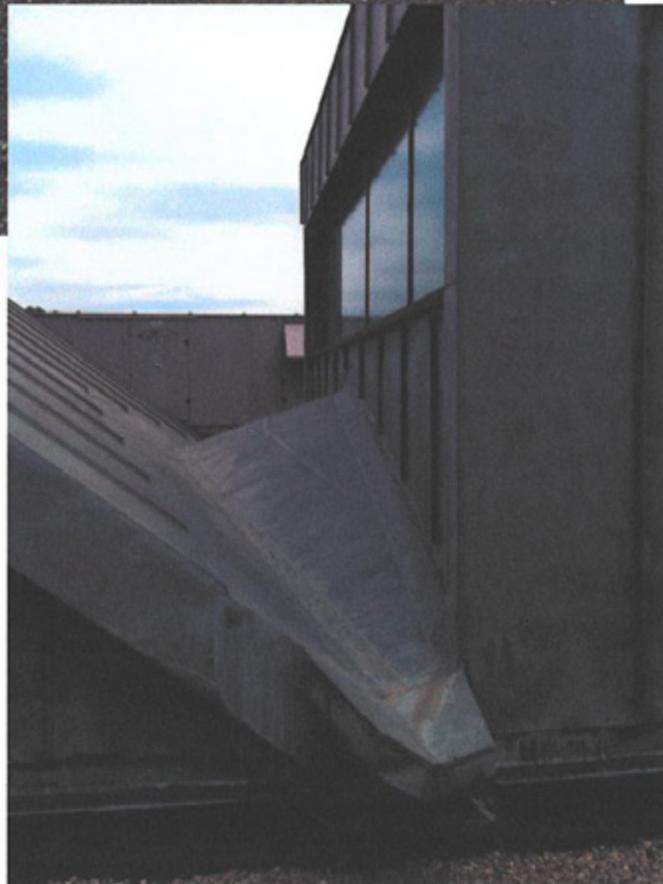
The central portion of the roof features three large copper clad roof monitors that are surrounded by HVAC equipment (Above). The Roof monitors are standing seam copper with welded joints and appear to be in very good shape (PHOTO #4 - Right).
